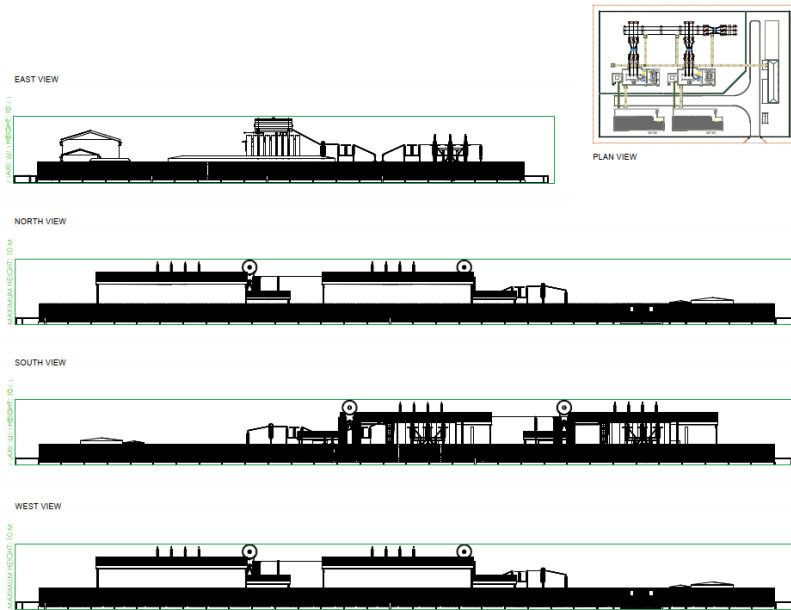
Sunnica West Site A Substation Elevation – 132kV solution (illustrative) (See Figure 3-9a of the Application [EN010106/APP/6.3])
